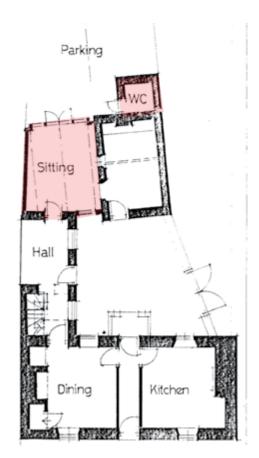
Holly Cottage Proposed Ground Floor Plan
